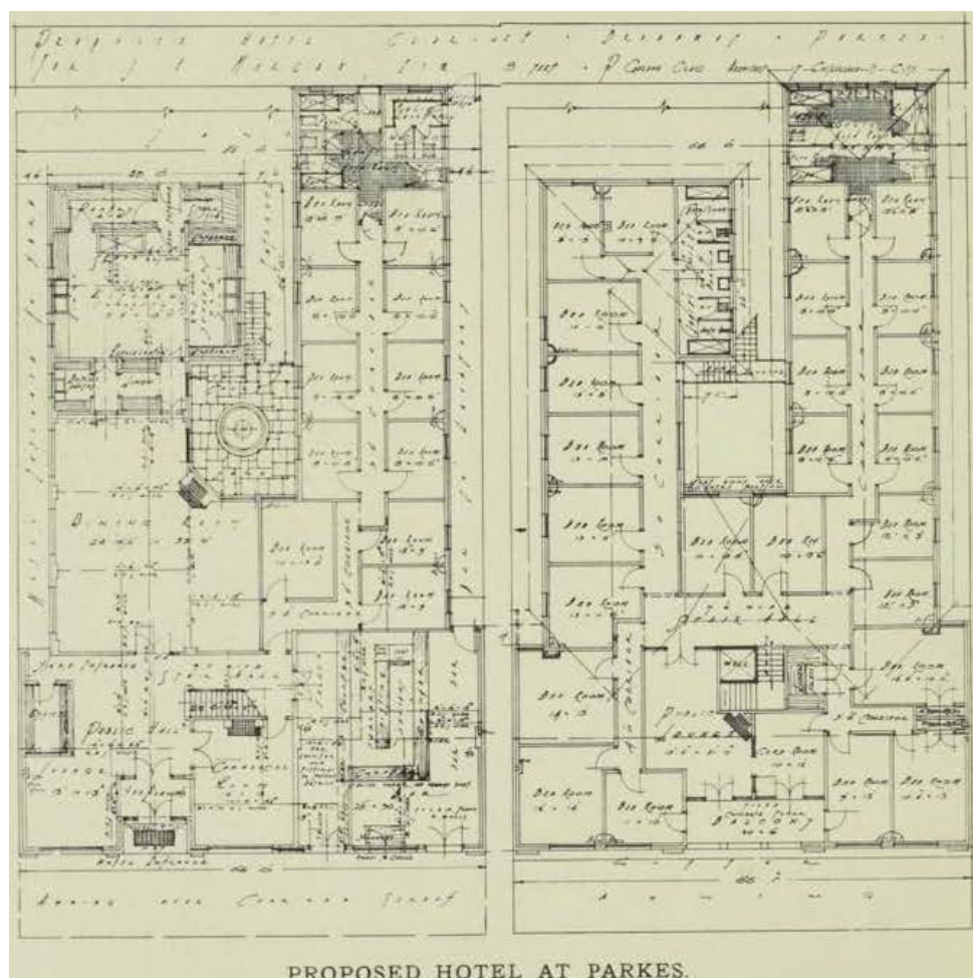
Ground Floor & First Floor Plans, Hotel at Parkes, 1930. Architect: P. Gordon Craig (Source: "Building Australia", *Building*, 12 March 1930, p.46)
